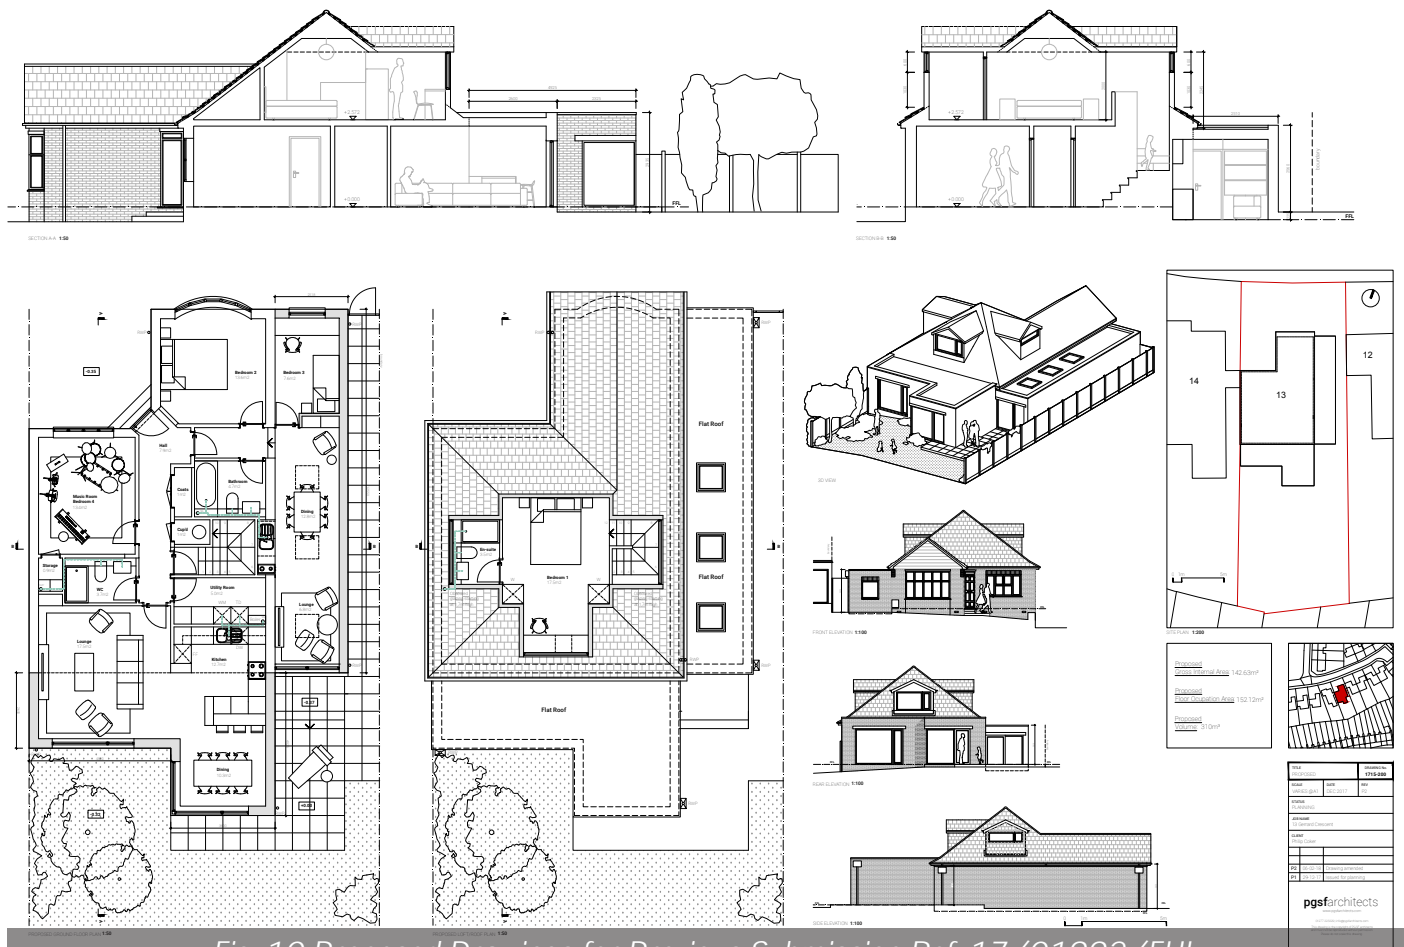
Proposed Drawings for Previous Submission Ref: 17/01992/FUL
